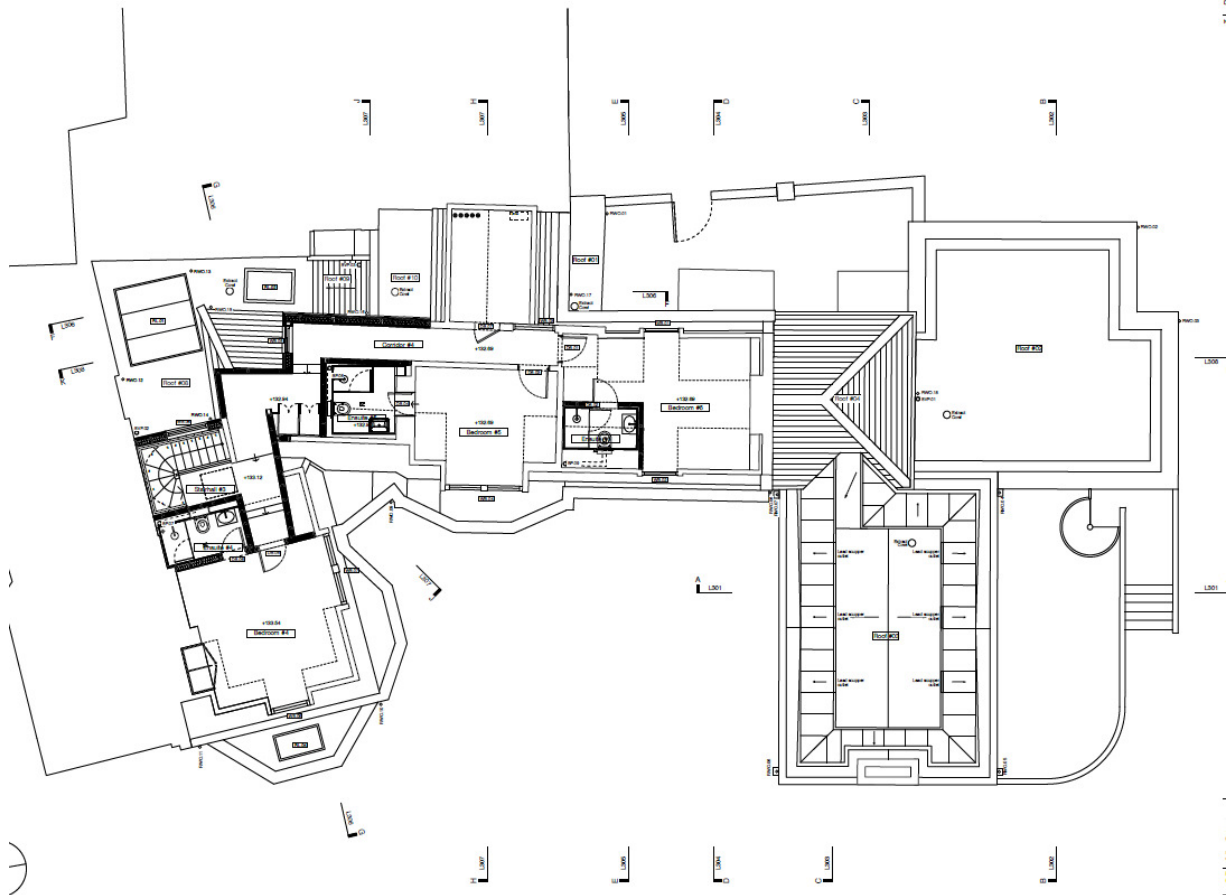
Proposed Second Floor Layout at Grove Lodge
